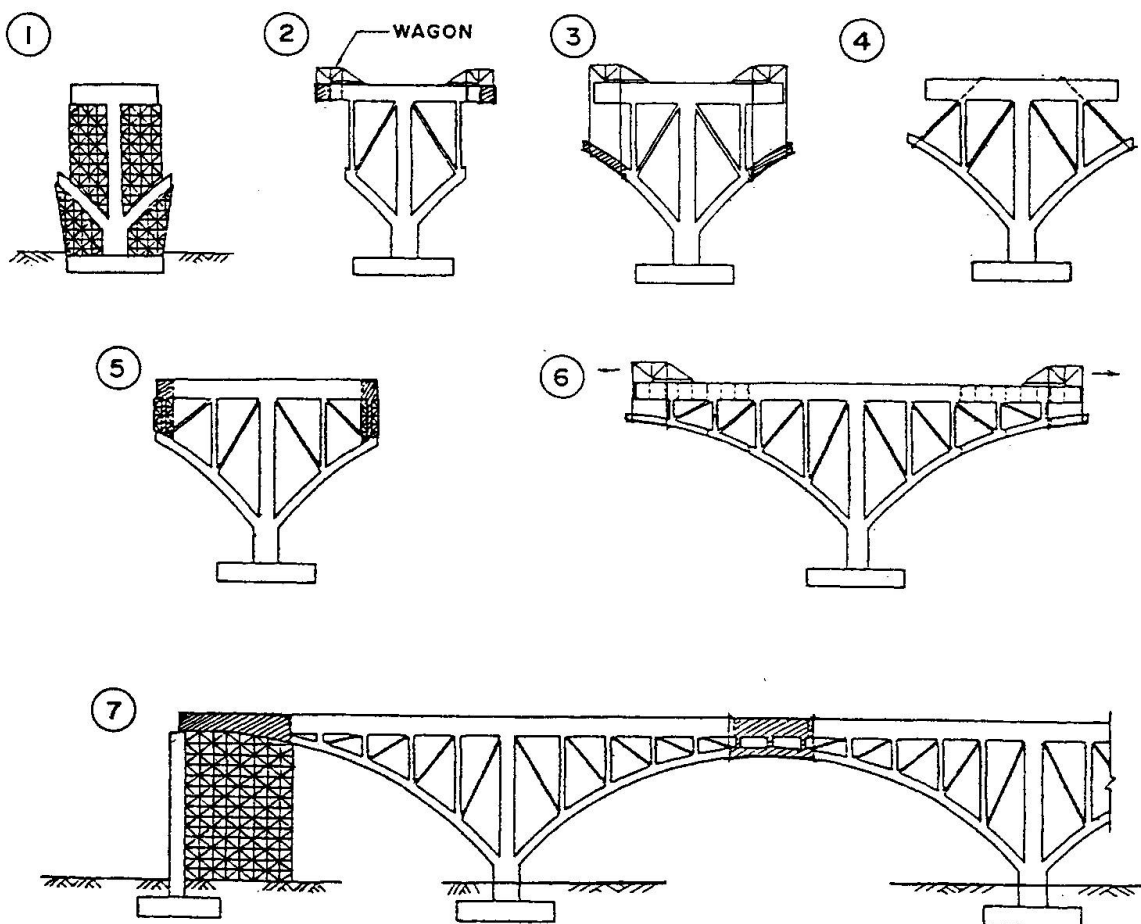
Erection sequence (1. Erection of pier column and first segment. 2. Erection of box girder with moveable wagon. 3. Erection of arch rib with wagon. 4. Placement of oblique constructional PC steel bars. 5. Erection of spandrel strut. 6. Repetition of process from stage 2 to stage 5. 7. Erection of arch crown section with hanging support and end side section with temporary support.).
